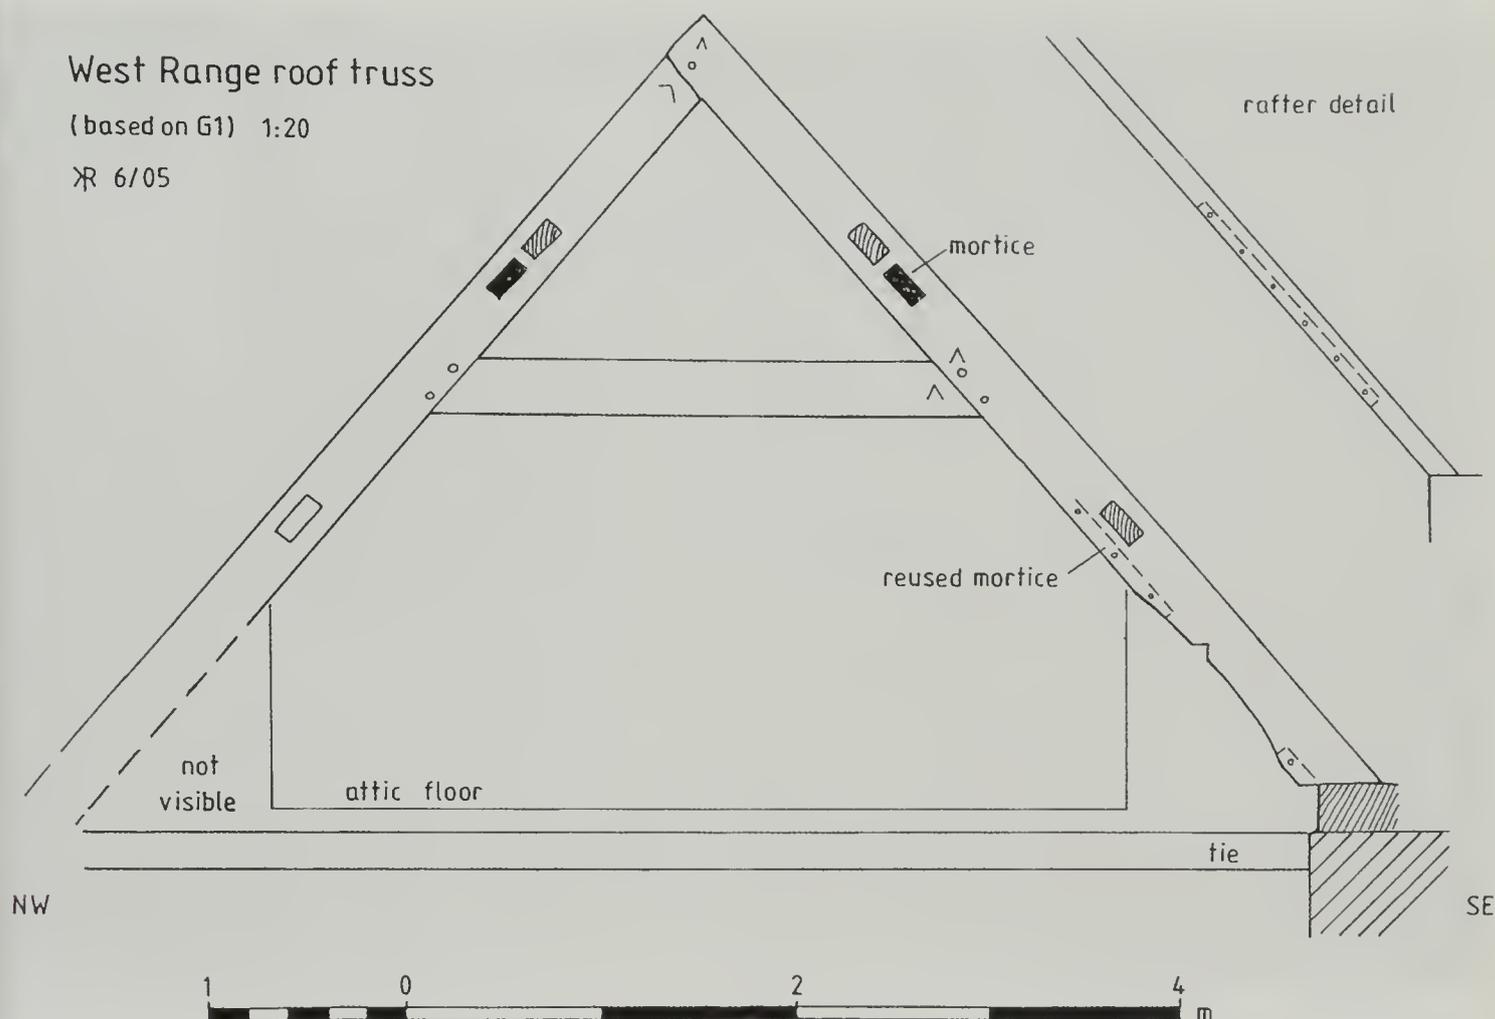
A re-used roof truss and common rafter in the west wing, drawing by Kirsty Rodwell
